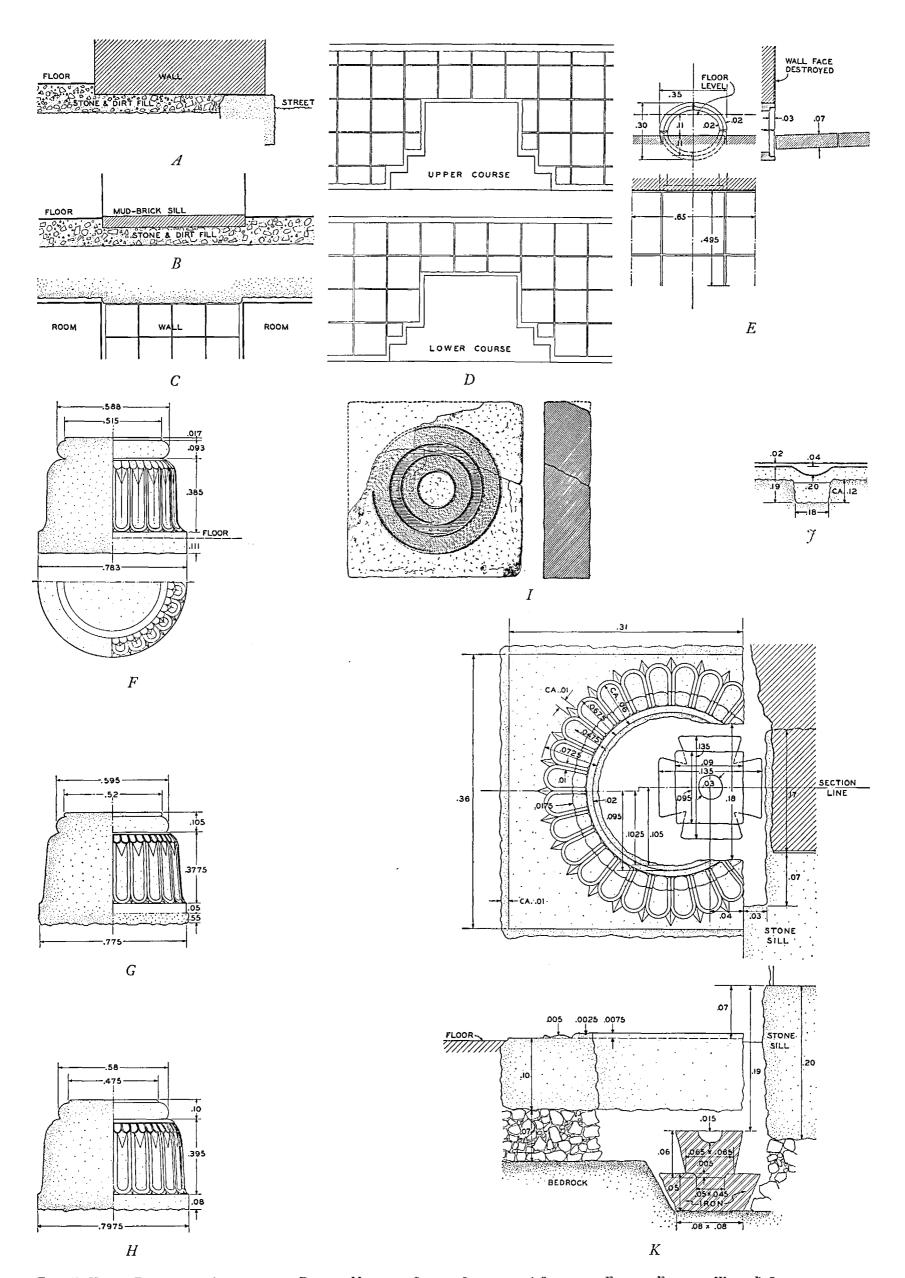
Harem. Diagrams of Architectural Details. Northern Service Quarters: A. Section of Eastern Exterior Wall. B. Section through a Doorsill. C. Sketch Plan of Wall Abutting Platform of Throne Hall. D. Bonding of Mud Bricks of Niche in Room 5. F. Column Base of Room 5. West Wing: E. Drain in Room 14. G. Column Base of Room 2. H. Column Base of Room 13. I. Glazed Brick Found South of Corridor 12. J. Section through Drain and Floor in Corridor 1. K. Iron Door Socket and Ornamental Ring Stone of Eastern Doorway of Corridor 12. Scales, 1:20 (A-C, E-H, J), 1:40 (D), 1:8 (I), and 1:5 (K)
